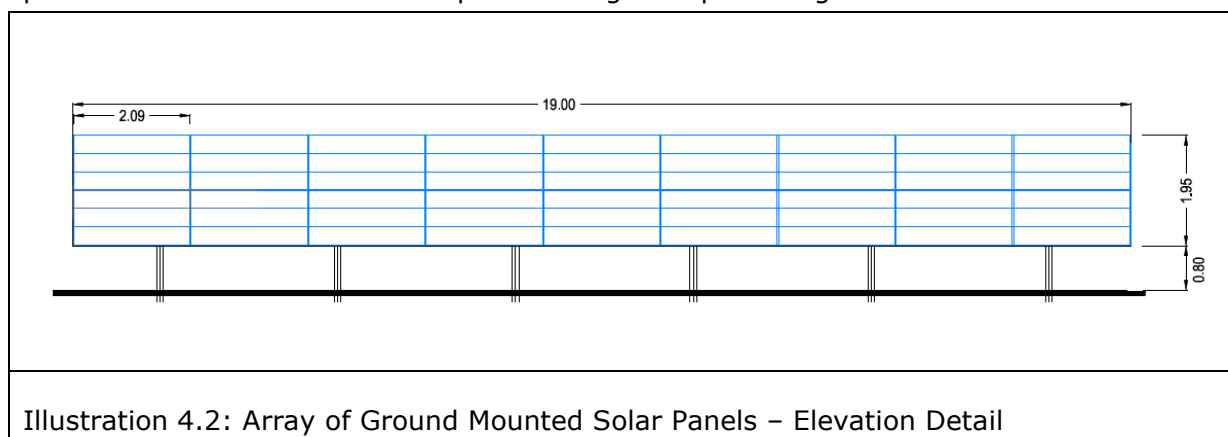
Array of Ground Mounted Solar Panels – Elevation Detail
